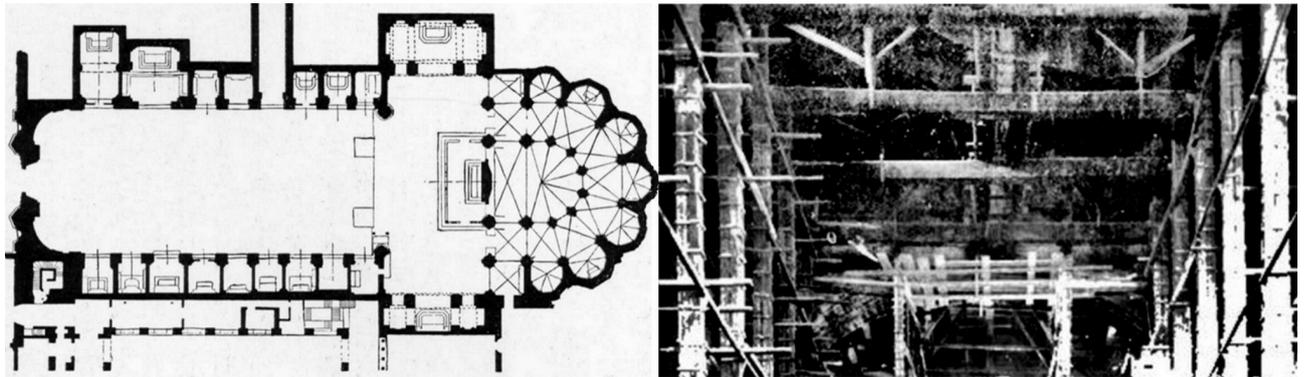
Plan of St. Laurence (left) and view of the seventeenth century trusses before demolition (right)
